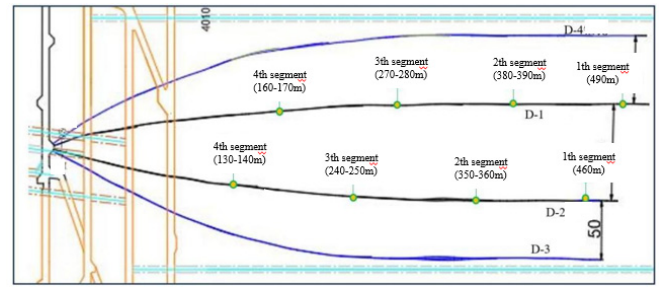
Hydraulic fracturing construction design for Xida 1-05 drilling field
